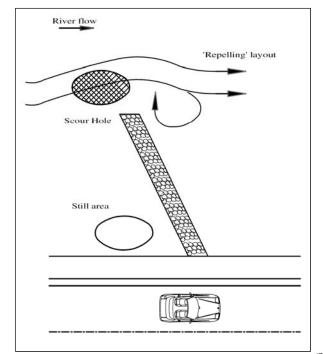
Plan view of repelling flow spur layout ^(8.9)
